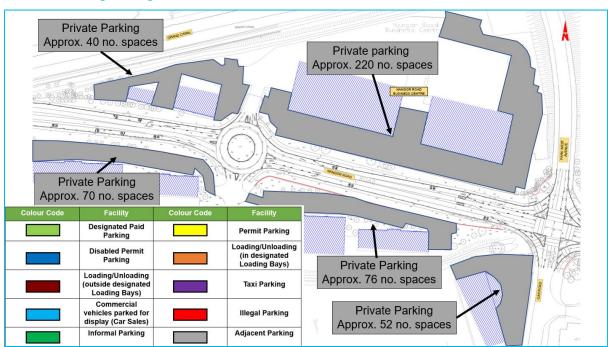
New Nangor Road between M50 overbridge and Oak Road Parking Facilities
